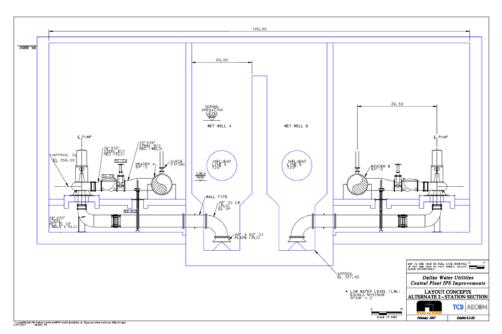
Layout for a Trench-Type Wet Well Dry Pit/Wet Pit Pump Station
